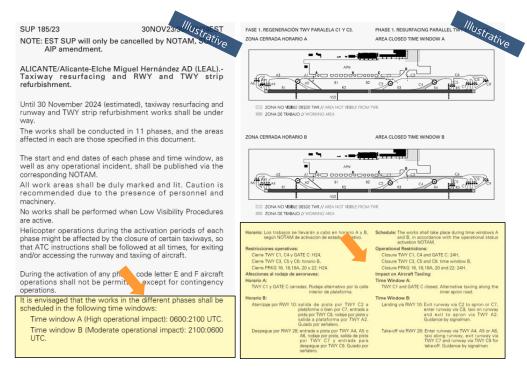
Alicante (ALC) airport – RWY & TWY refurbishment / Planning – Construction phasing in "time windows" (example)
